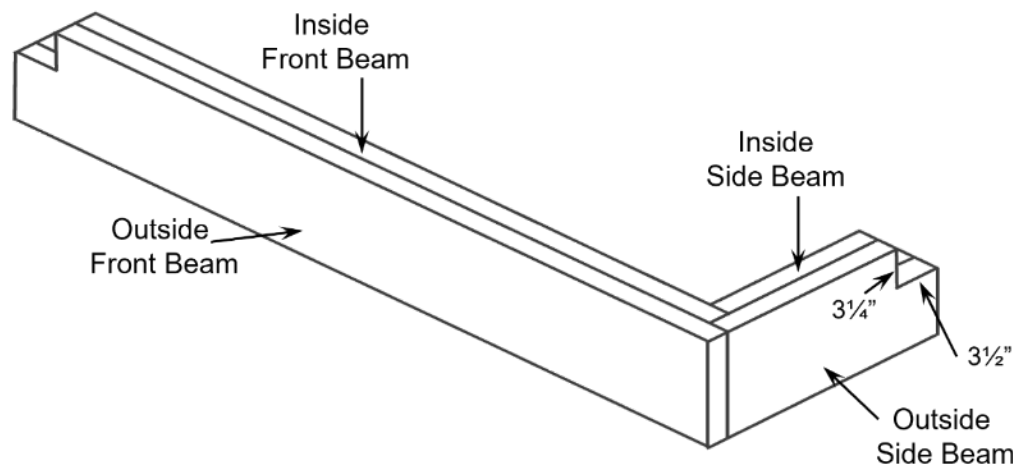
Front and Side Beam Layout for a Porch with One Side Beam
